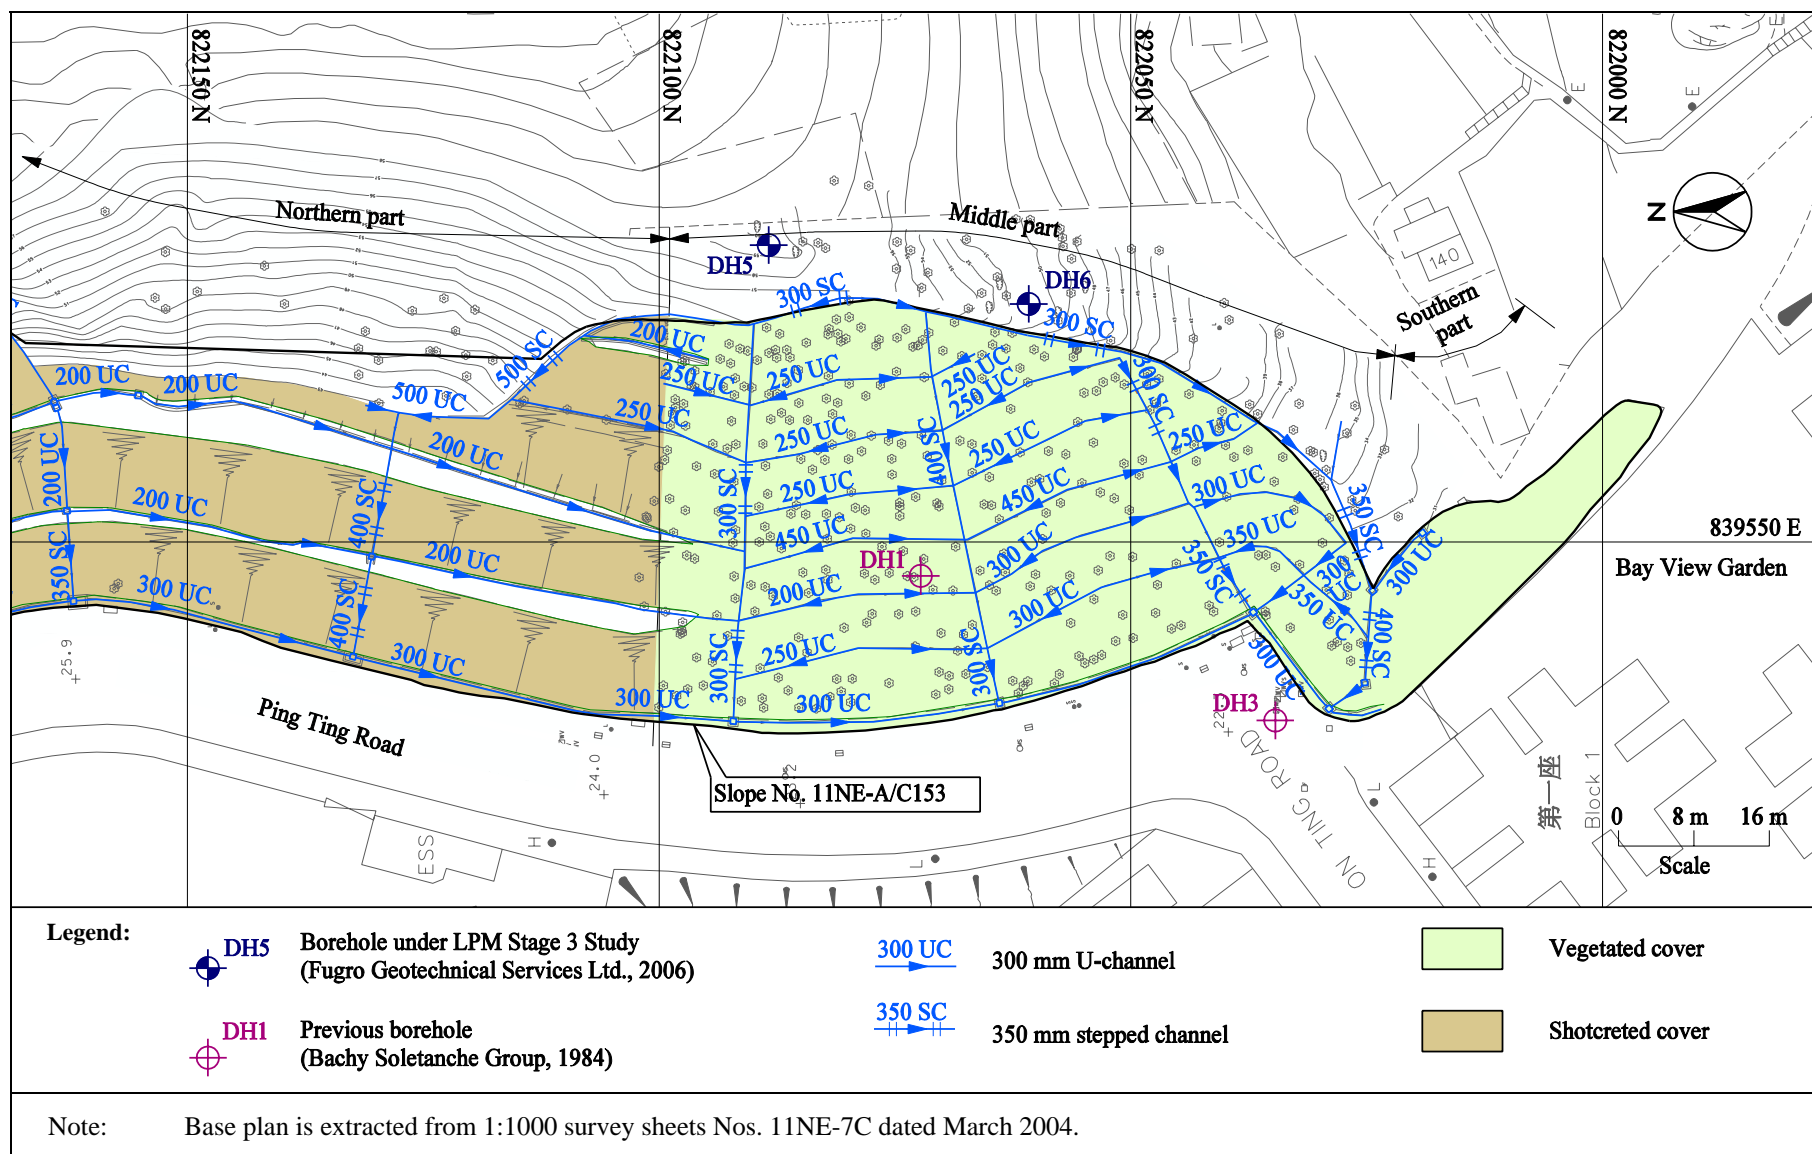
Site Layout Plan (Sheet 2 of 2)
